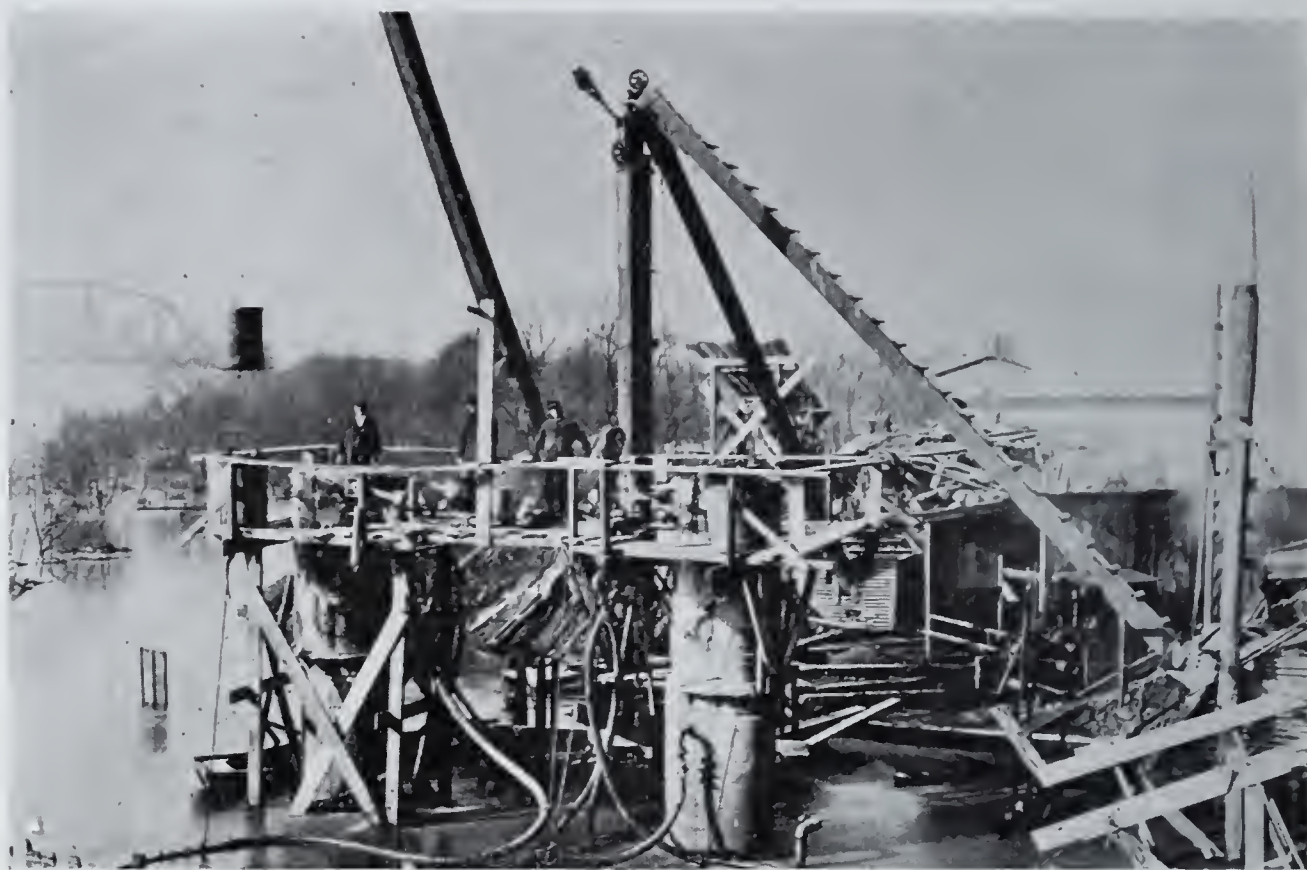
Beaver River Bridge. West Abutment. Caisson with Air on; 28 Feet of Water.
